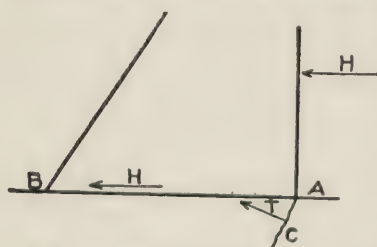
Horizontal or Diagonal Tension in Foundation.
